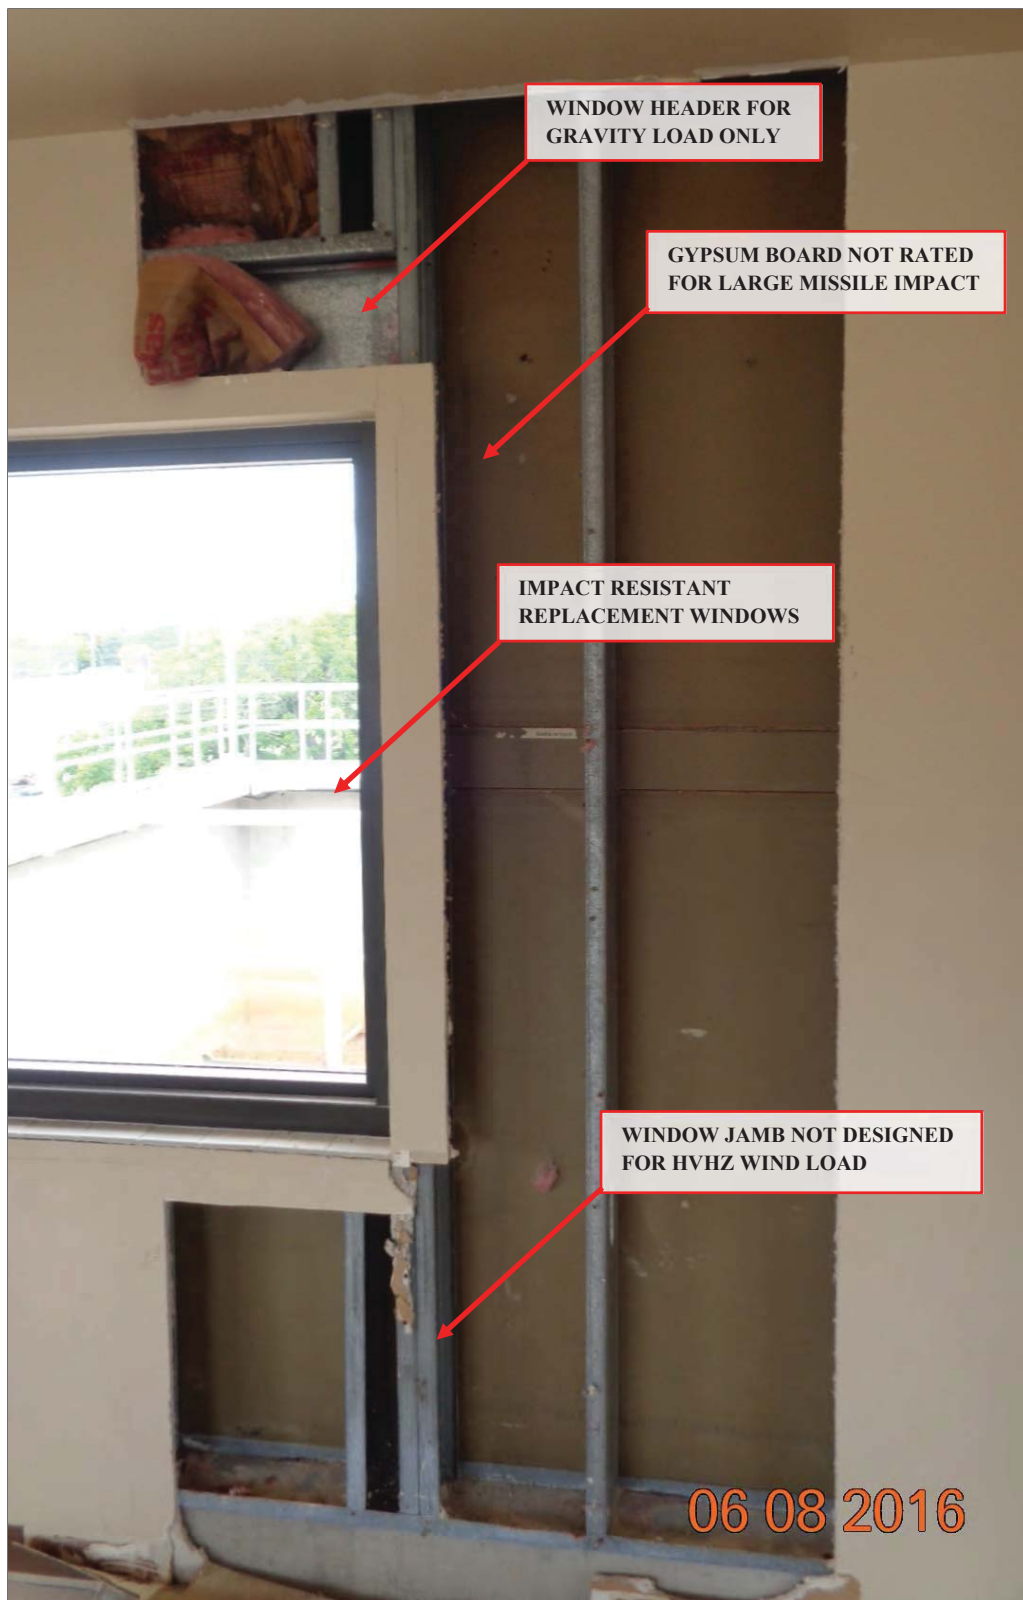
Filter Gallery Expansion - Stud Wall Assembly
